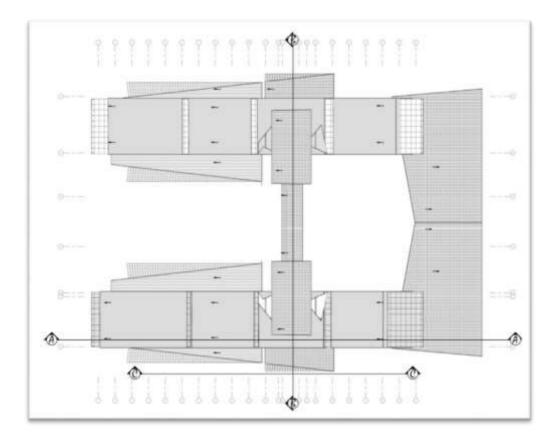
Proposed roof plan Source: Researcher's design proposal, (2020)
